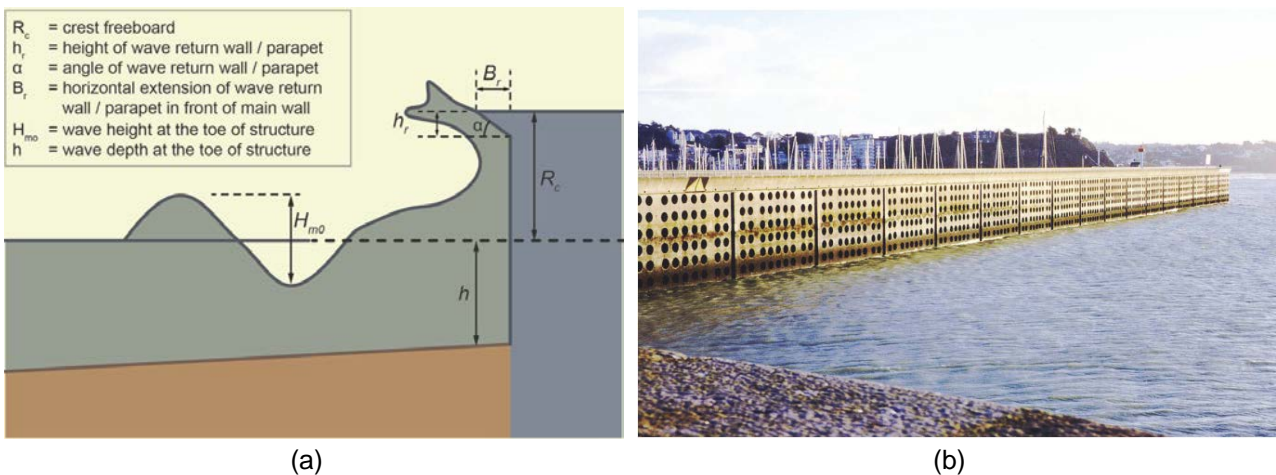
Reduction of wave run-up and overtopping at vertical walls, a: wave return wall, b: perforated caisson. Source: Figure 7.21 and Figure 7.24 in EurOtop (2016)
